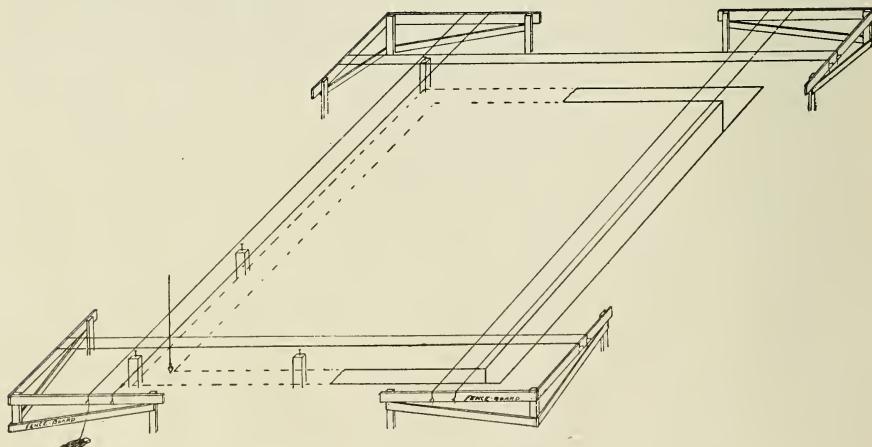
Stakes and Construction Lines indicating location of foundation walls.
